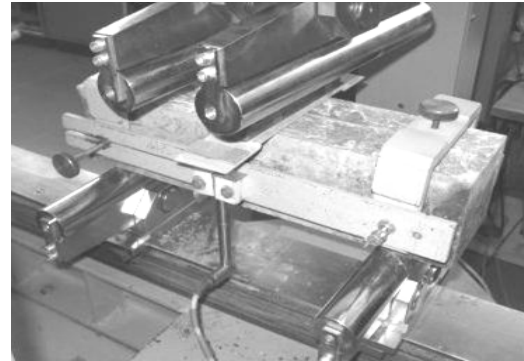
Testing device with fiber reinforced concrete prism inside it
